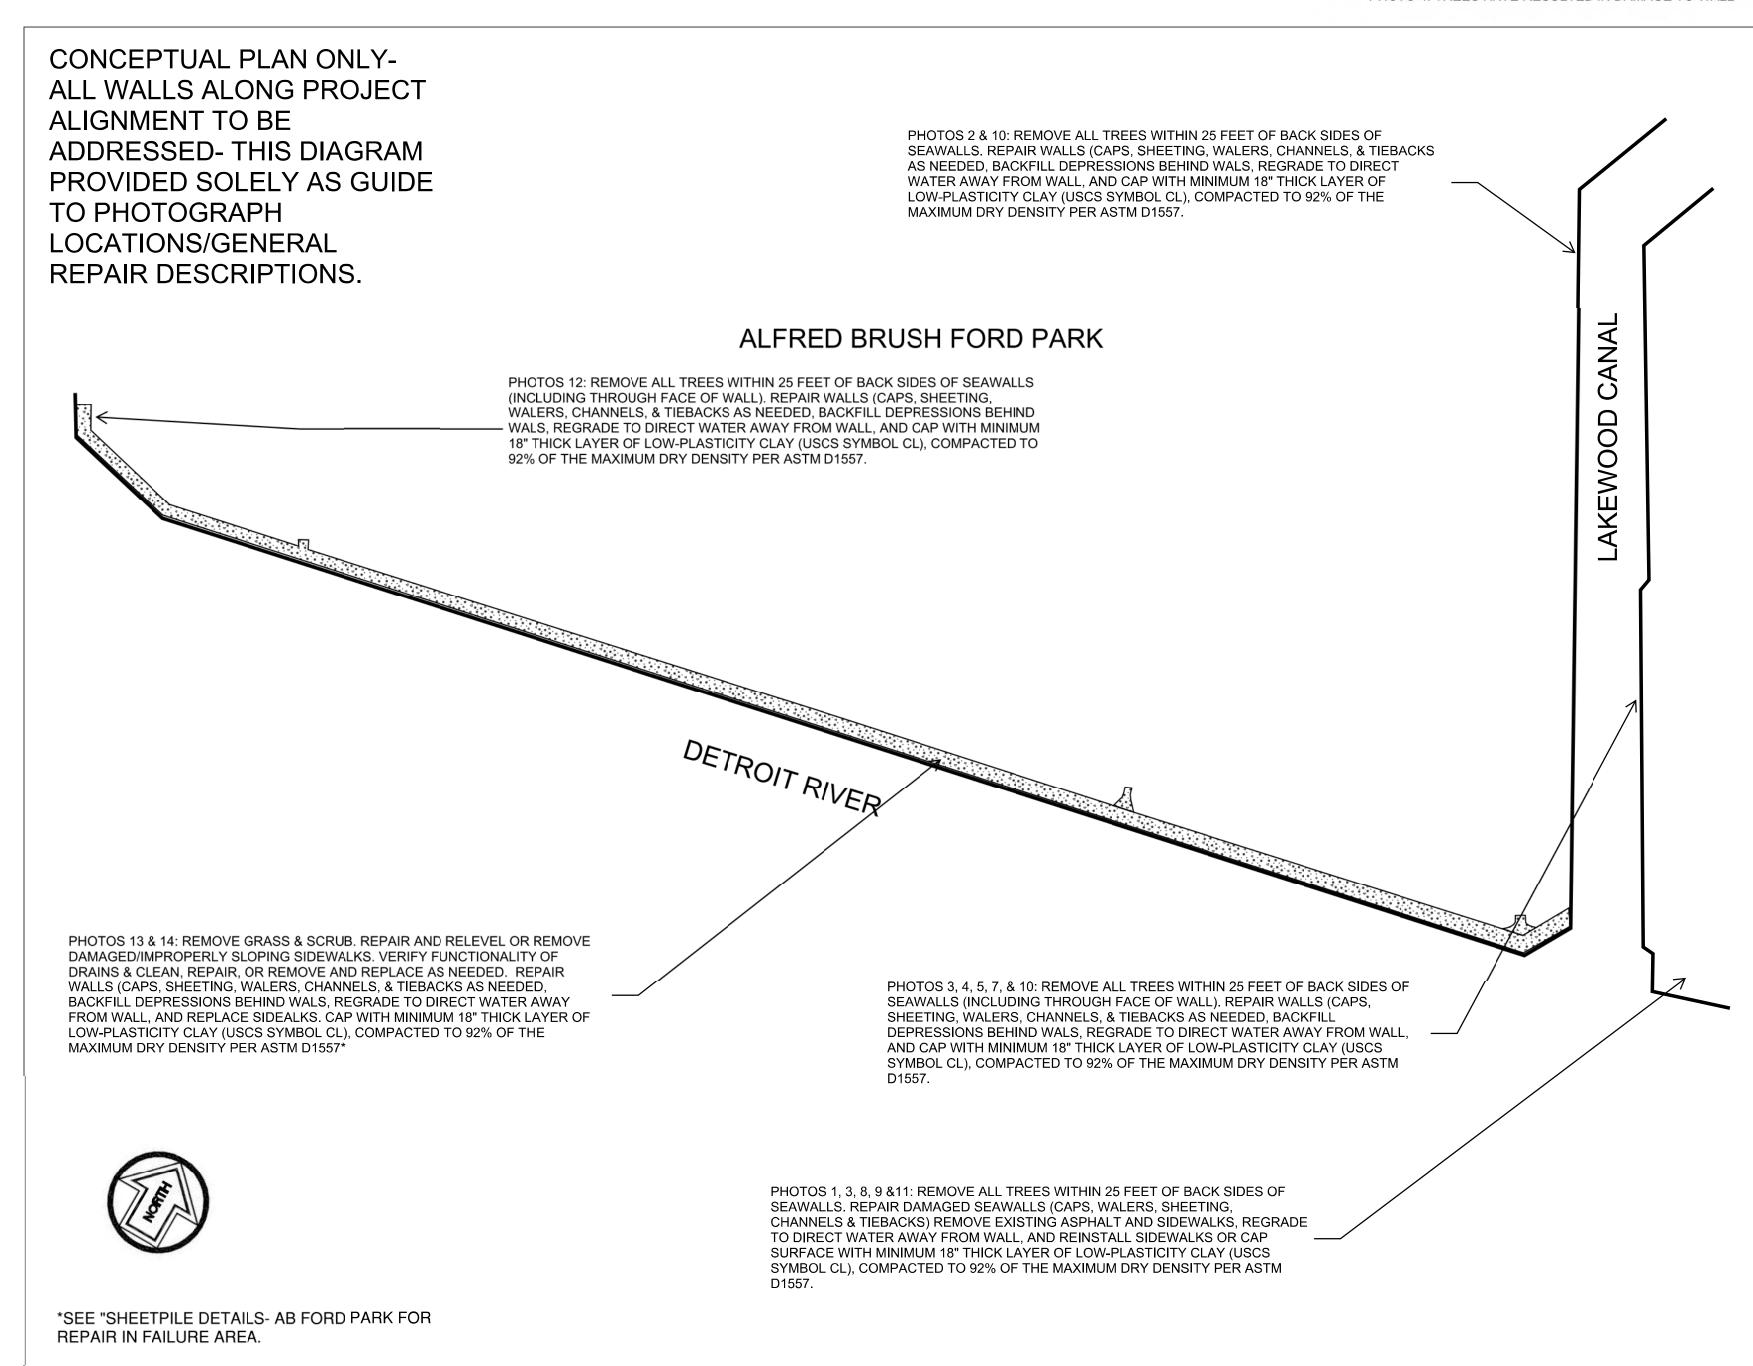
ALFRED BRUSH FORD PARK WALL MAINTENANCE
